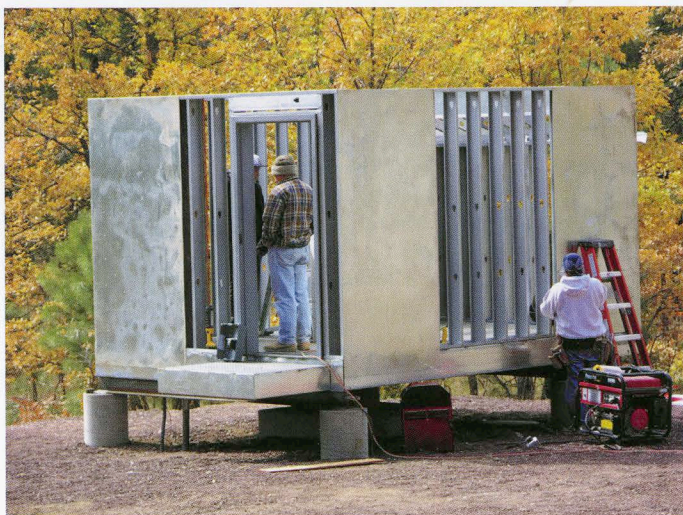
The metal building is constructed by a crew from Loven Contracting, Inc.
